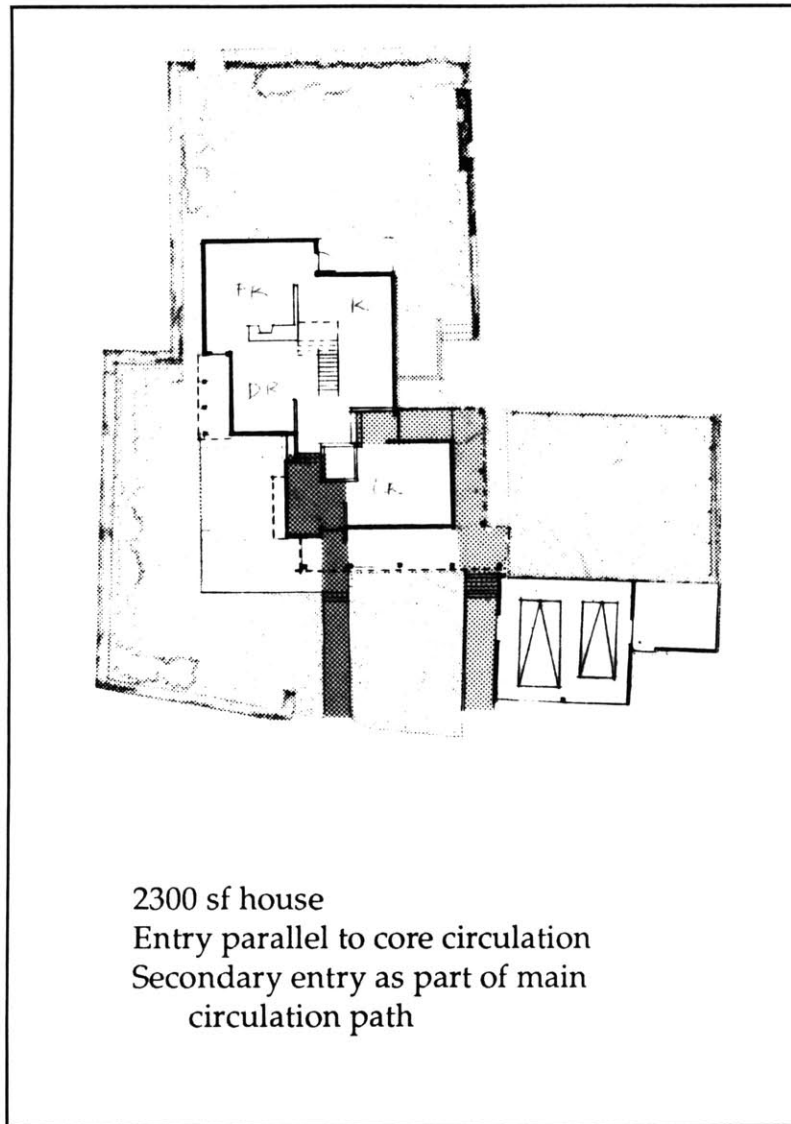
Similar massing organization, site specific floor plan and entry arrangement
